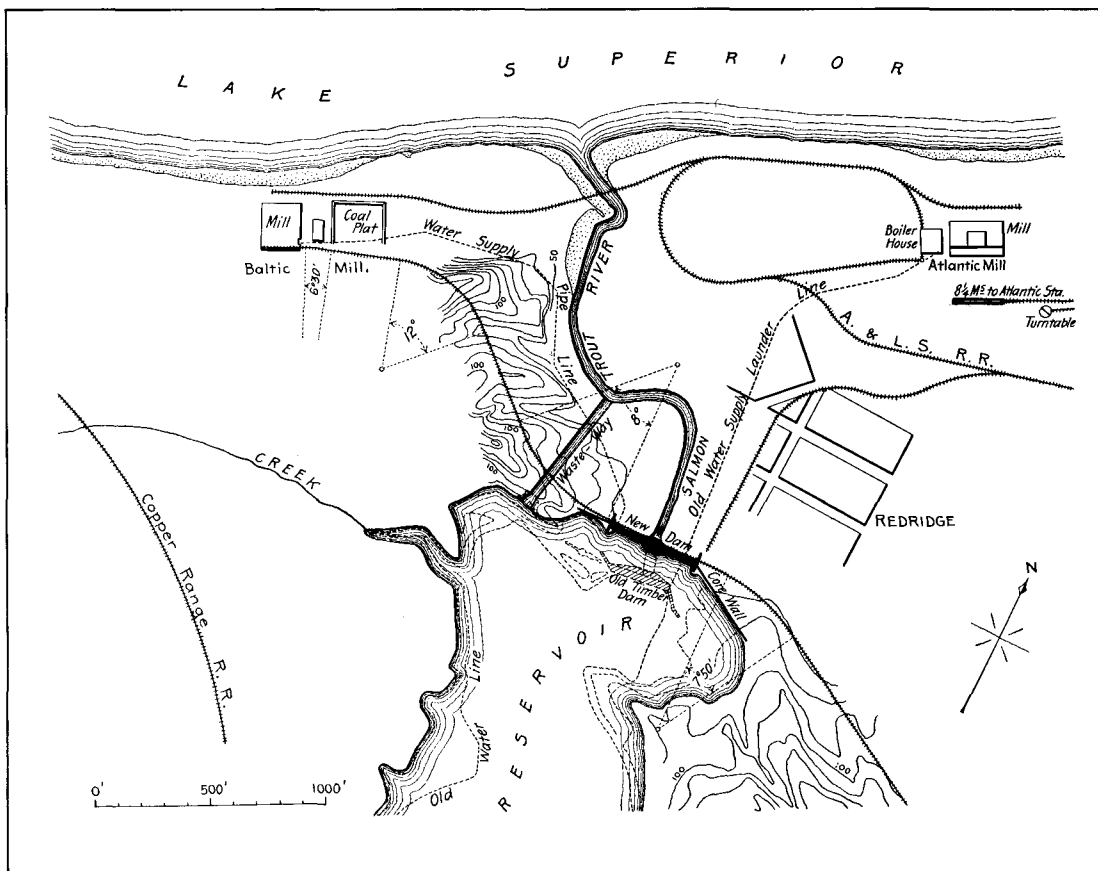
Site plan of the steel dam at Redridge, Michigan, 1901. From *Engineering News* 46 (August 15, 1901): plate following p. 101.
